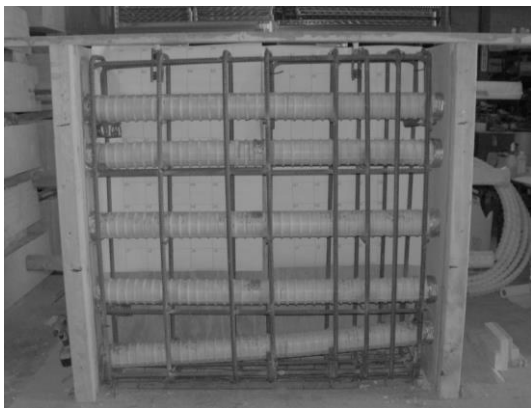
Mock-up tendon duct wall sample prior to concrete placement
